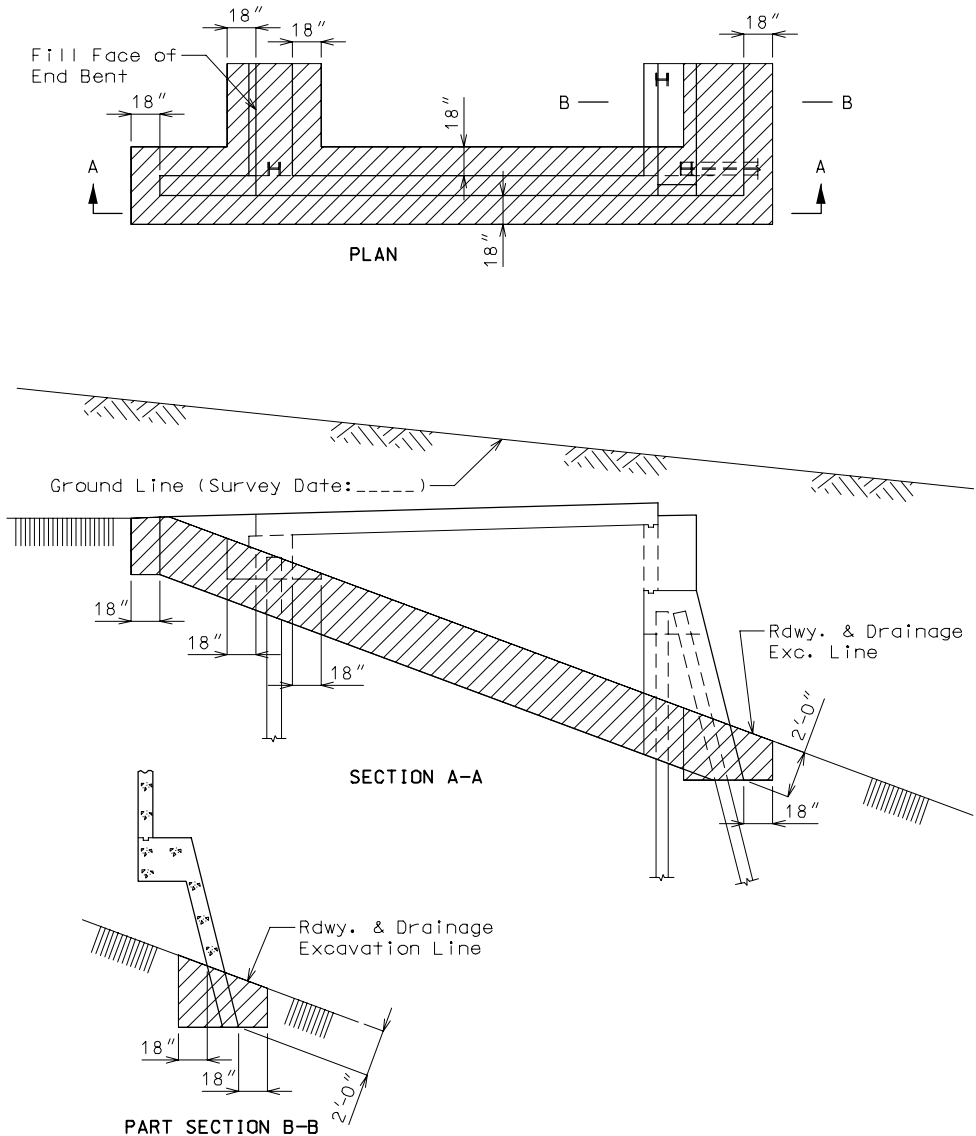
Semi-Deep Abutment Excavation Limits (Case 1 *)
